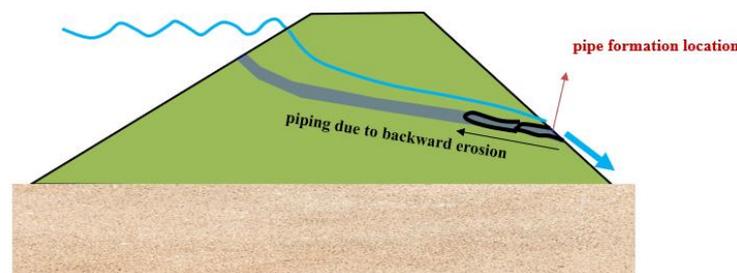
Failure by the formation of pipes within the embankment body or the foundation soil below the embankment
